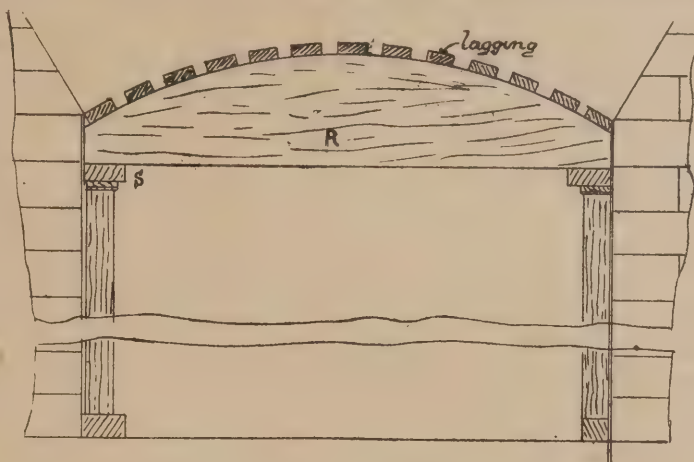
A SMALL RIB CENTRE. ELEVATION.
